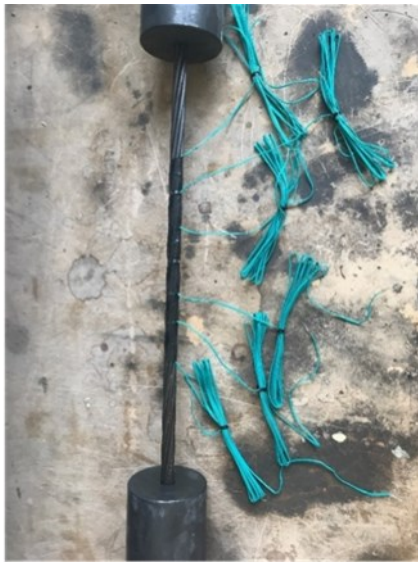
Piece of strand clamped for tensile test with 6 strain gauges applied to the external wires.
